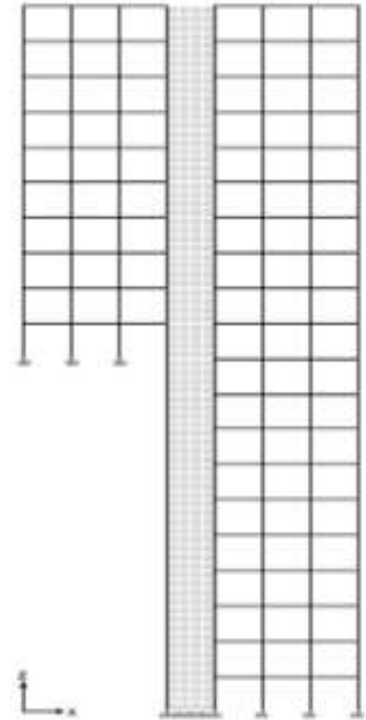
Model 6-Building on Steep Slope with Shear wall.
